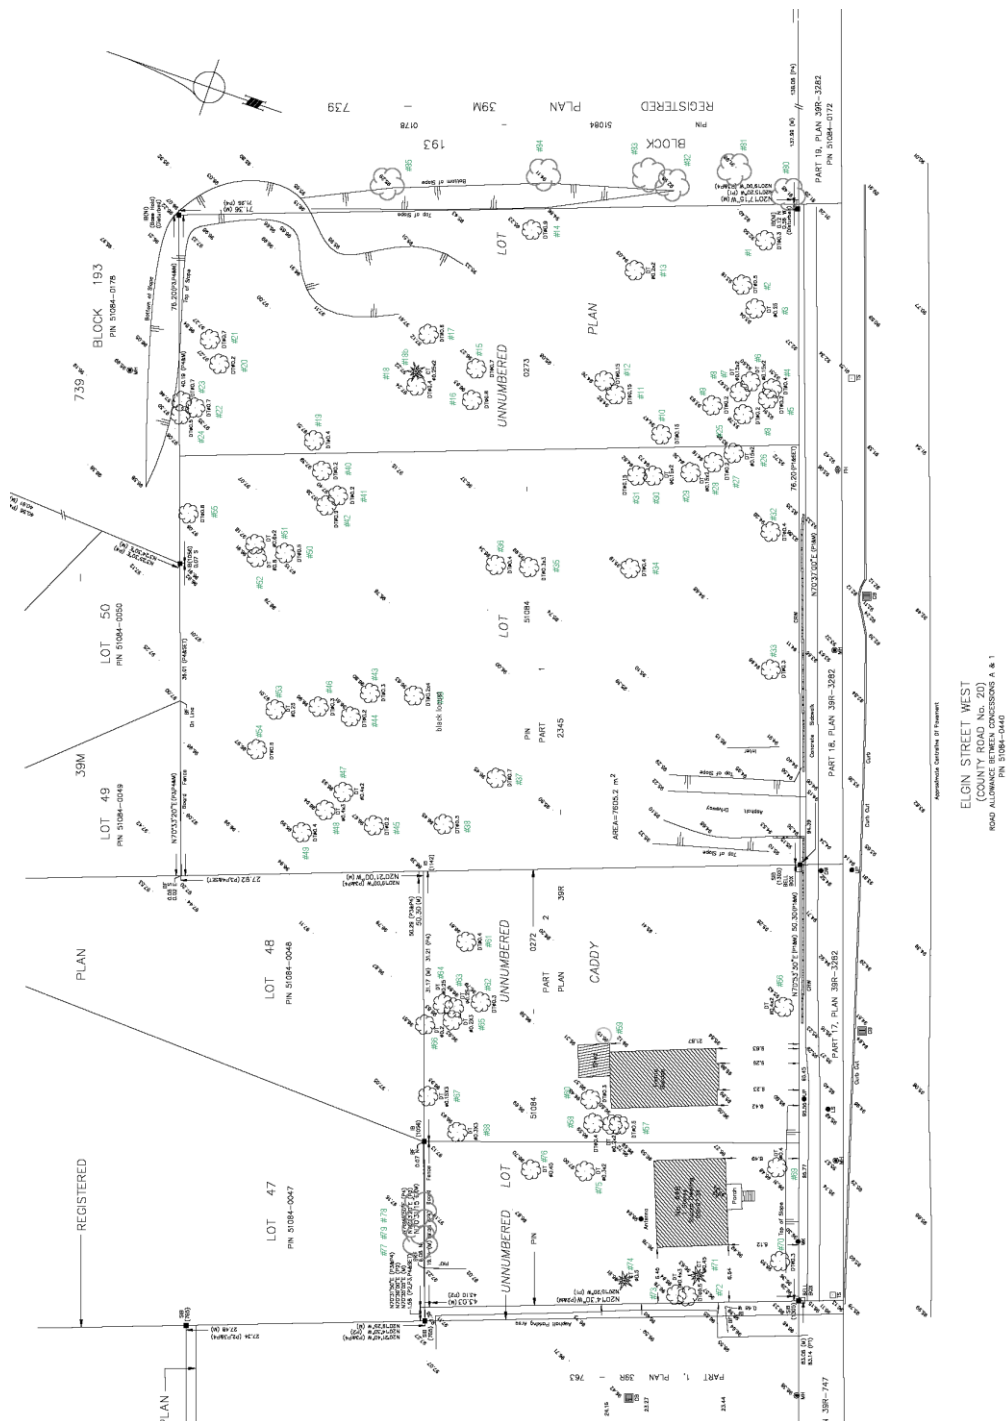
Arborist's Plan and layout of the 440 to 448 Elgin Street West property, with trees are numbered (green).
